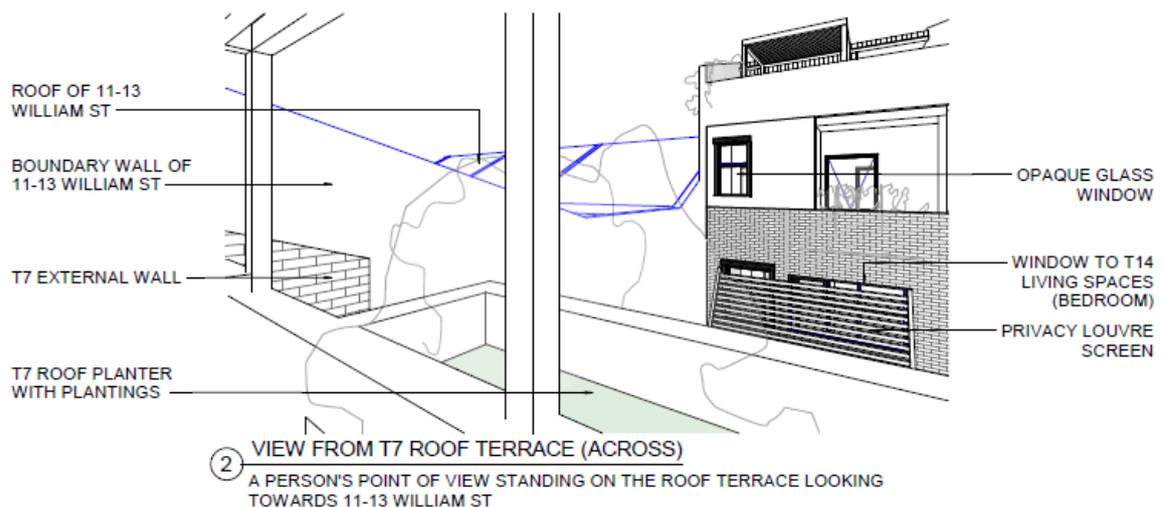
Planter boxes at the roof level are not able to directly overlook neighbouring dwellings and are prevented from overlooking bedrooms by fixed louvre screens
